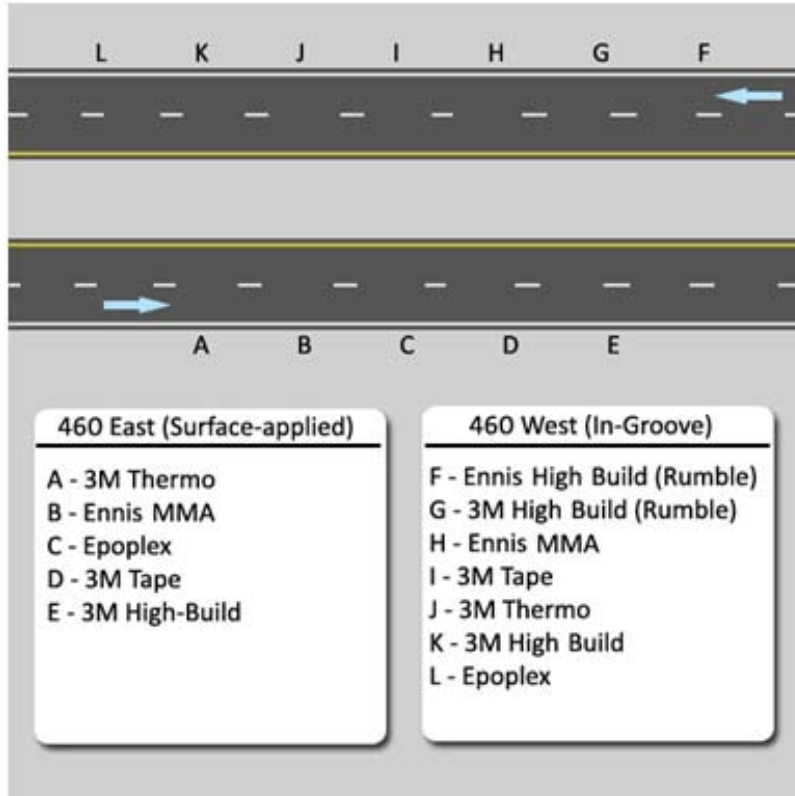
Pavement marking layout on Route 460 in Blacksburg, Virginia.
